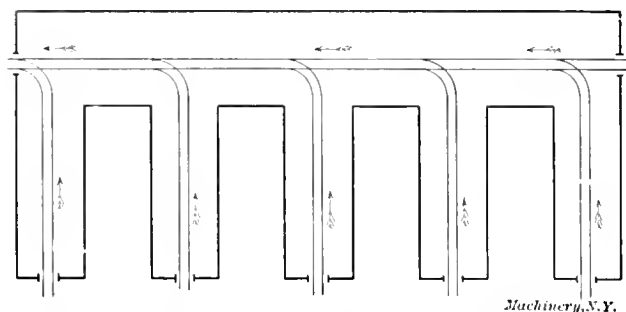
A Typical Layout of a Large Machine Manufacturing Plant.
